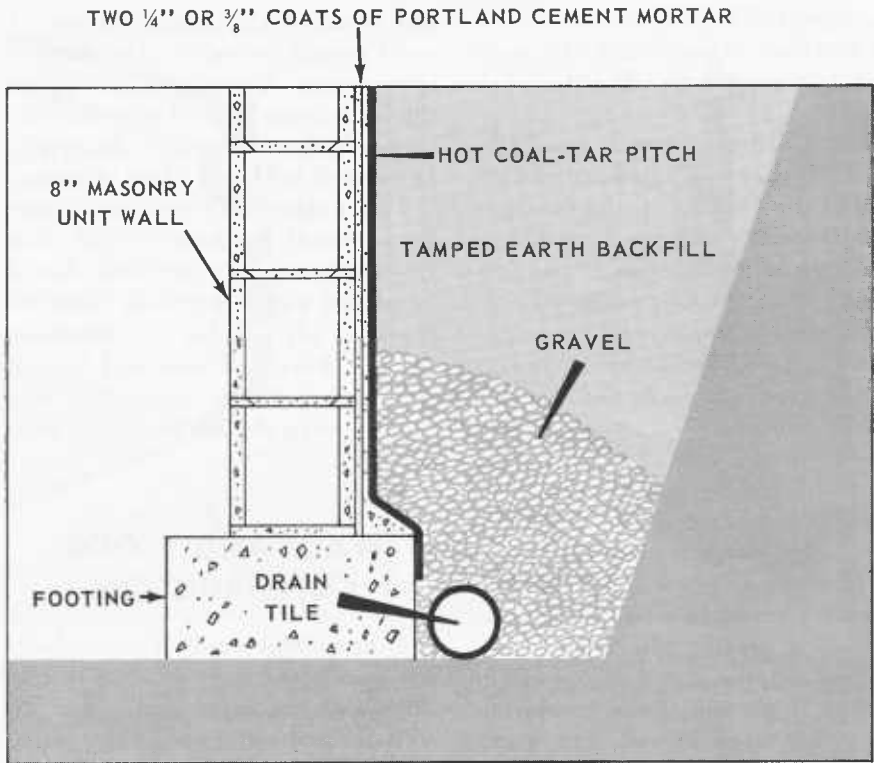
Waterproof construction of masonry unit walls. In very poorly drained soil, the gravel should extend almost to the top of the excavation.
